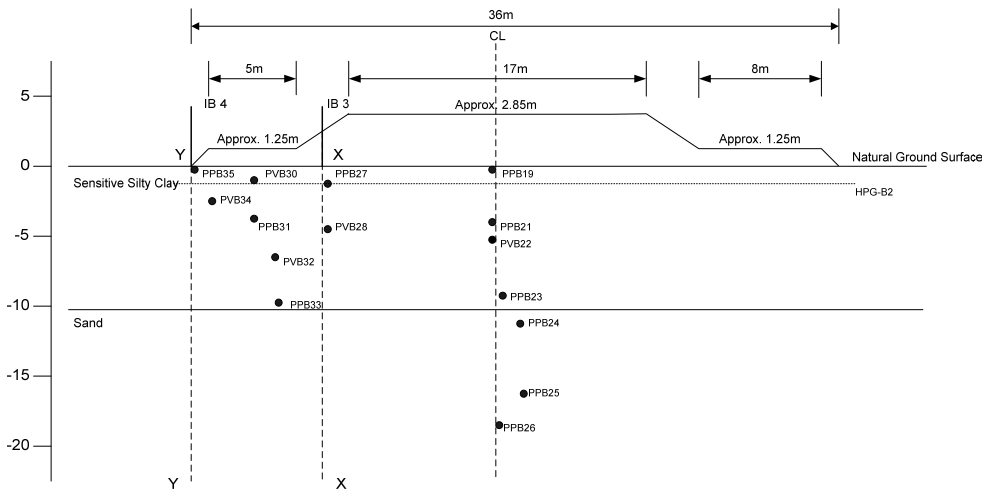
Cross section showing instrumentation layout plan for Section B (control embankment)
